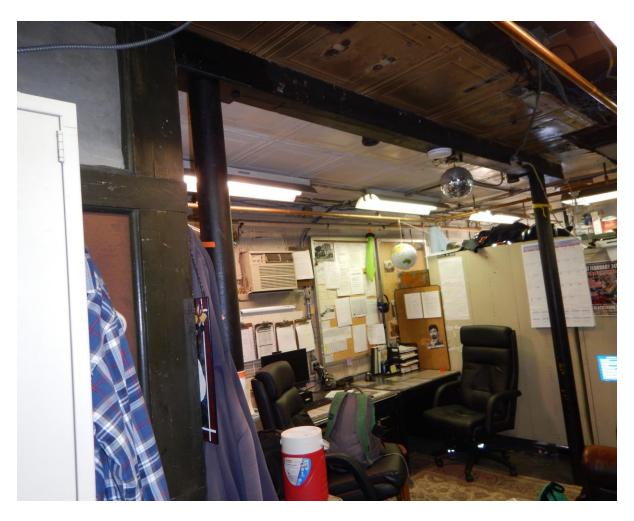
FIRST FLOOR FACING SOUTHWEST
